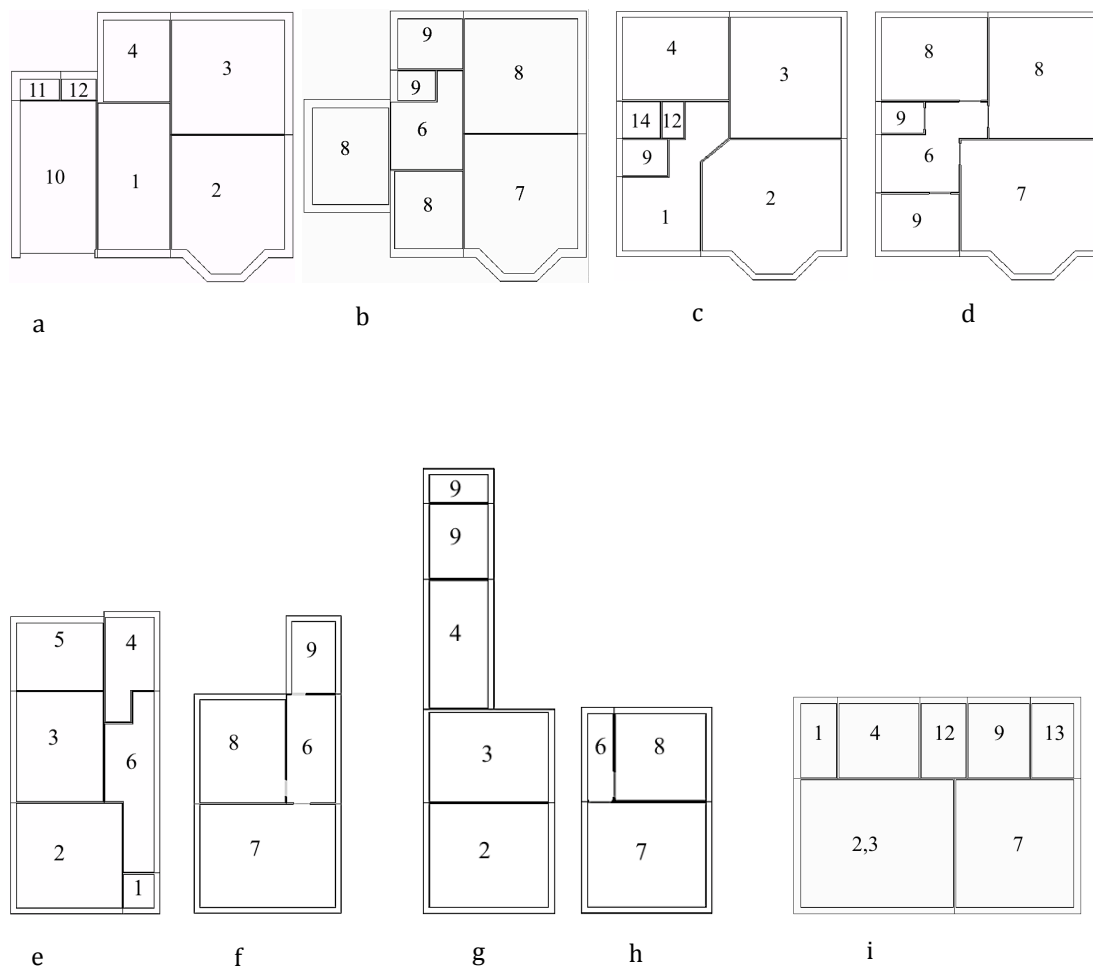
Plan of modelled dwellings for (a) HA1 ground floor; (b) HA1 first floor; (c) HA2 ground floor; (d) HA2 first floor; (e) HA3 ground floor; (f) HA3 first floor; (g) HA4 ground floor; (h) HA4 first floor; (i) HA5. (1. Hall; 2. Living room; 3. Dining room; 4. Kitchen; 5.
